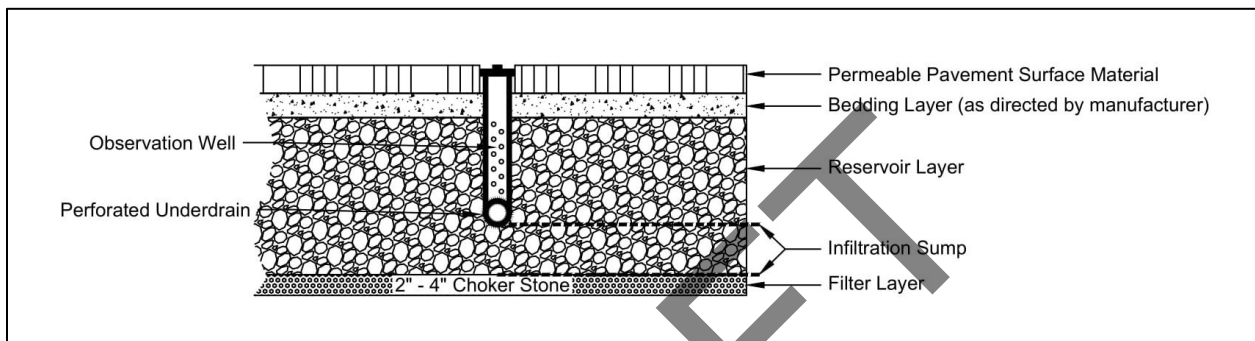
Cross section of an enhanced permeable pavement design with an underdrain.
